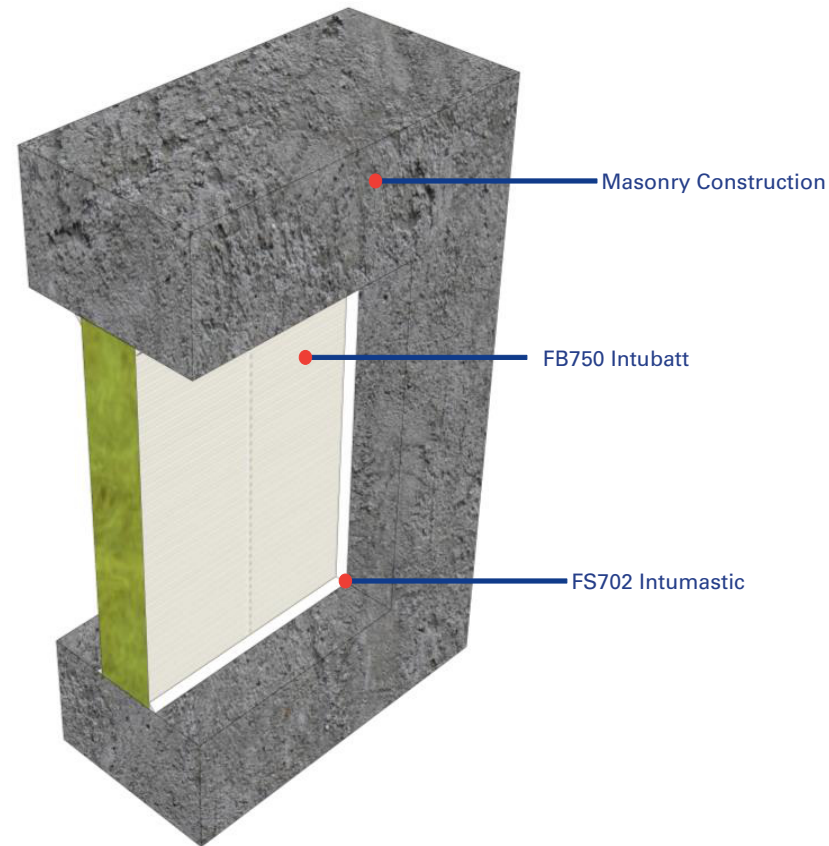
### Detail D – Double FB750 Intubatt up to 240 Integrity and Insulation
